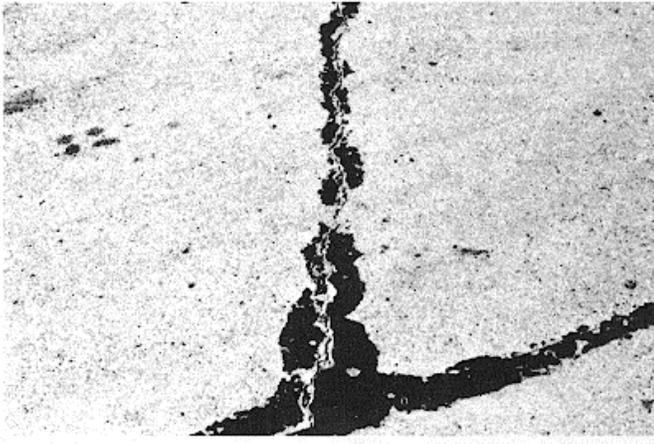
Low-severity linear cracking in a nonreinforced concrete slab.
